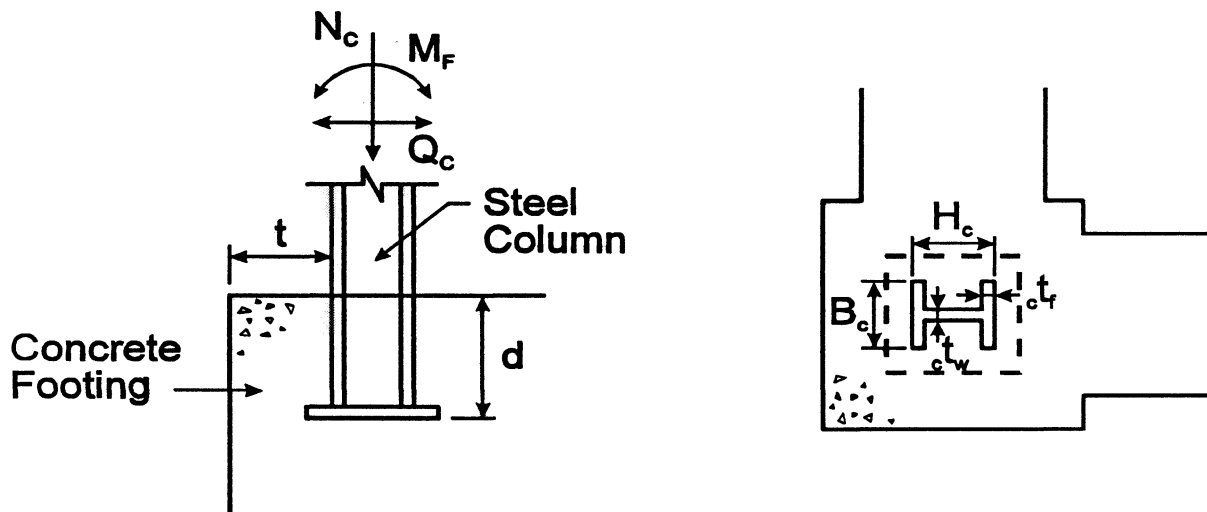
Embedded steel column (adapted from Morita, 1989)
